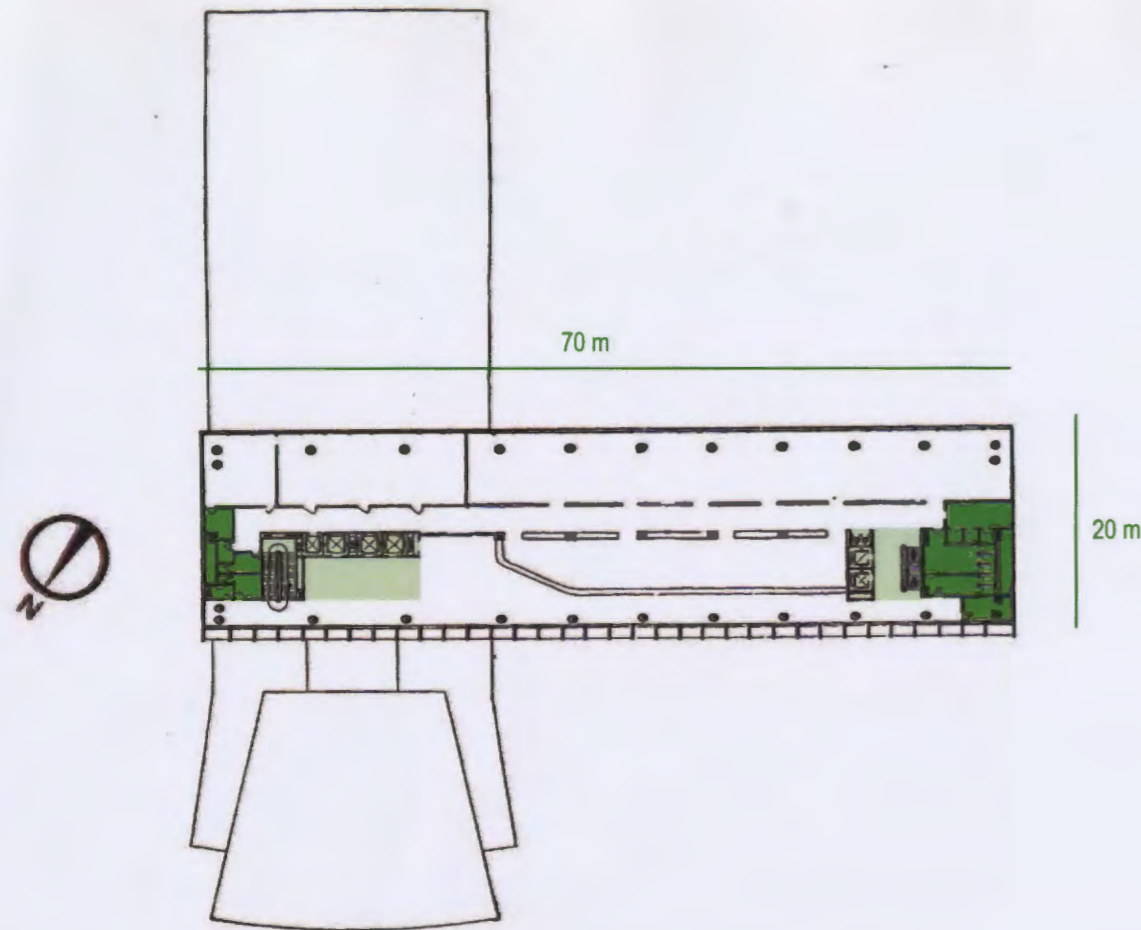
typical floor plan of tower block of Ministry of Education and Culture by Lucio Costa and Oscar Niemeyer
